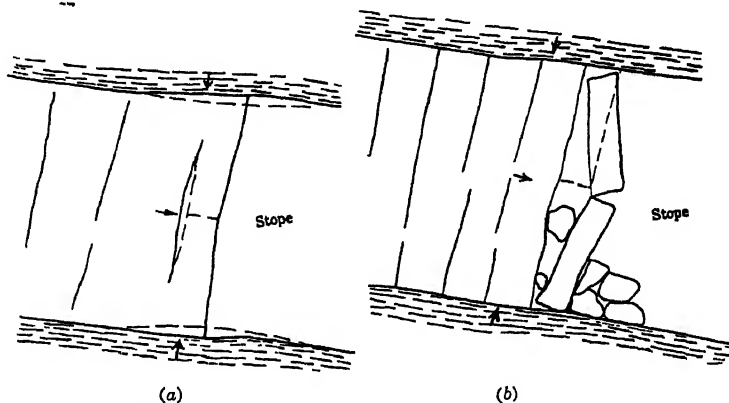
(a) MASSES OF ORE BROKEN FROM FACE OF PILLAR BY DISTORTION OF FACE—FIRST STAGE. (b) PILLAR FAILING THROUGH DISTORTION OF FACE—SECOND STAGE.
